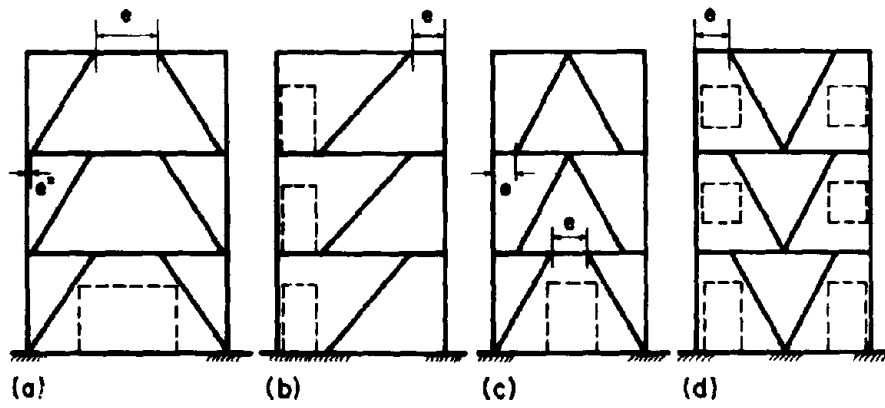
Alternative Arrangements for Eccentric Bracing Showing Possible Location of Architectural Openings [1].
